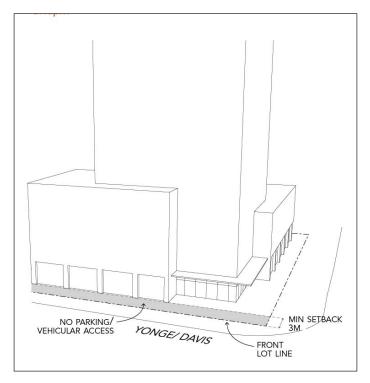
Example of Setback on Yonge Street or Davis Drive
